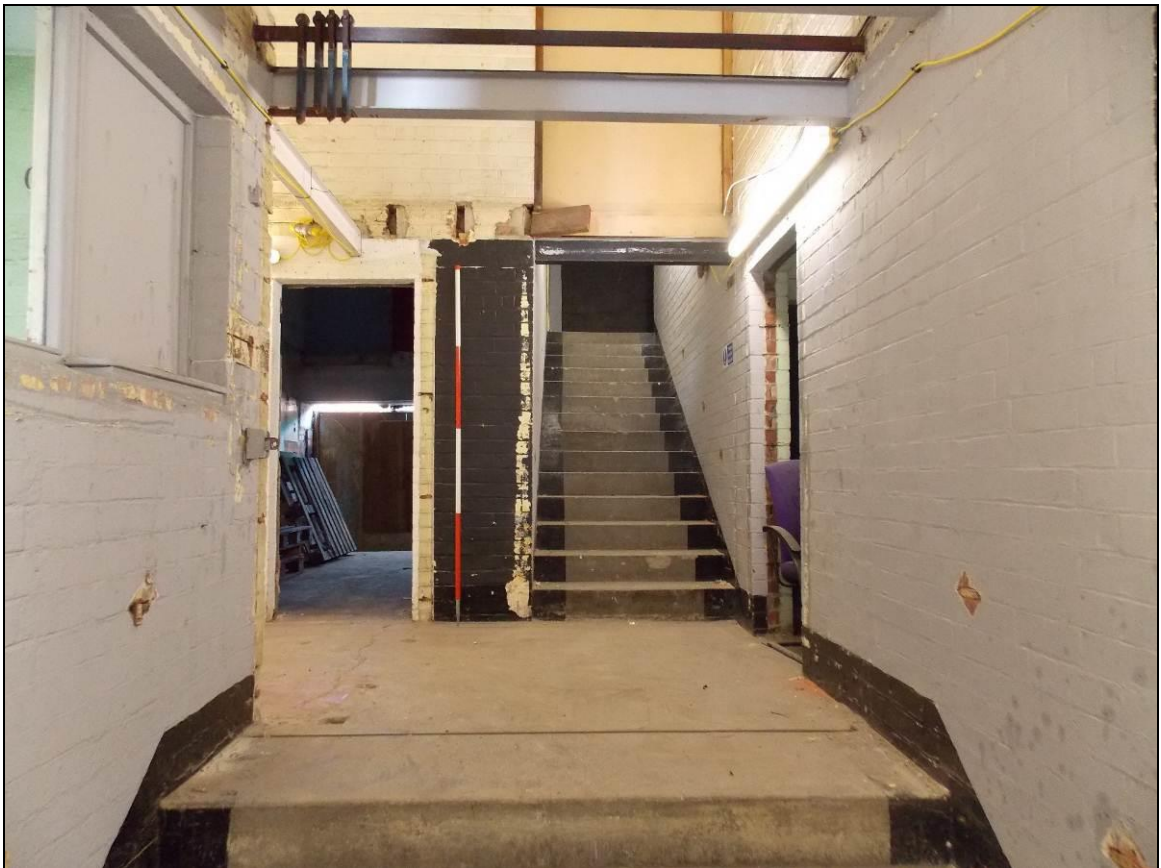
Staircase leading from the ground-floor to the first floor, 2m scale.
